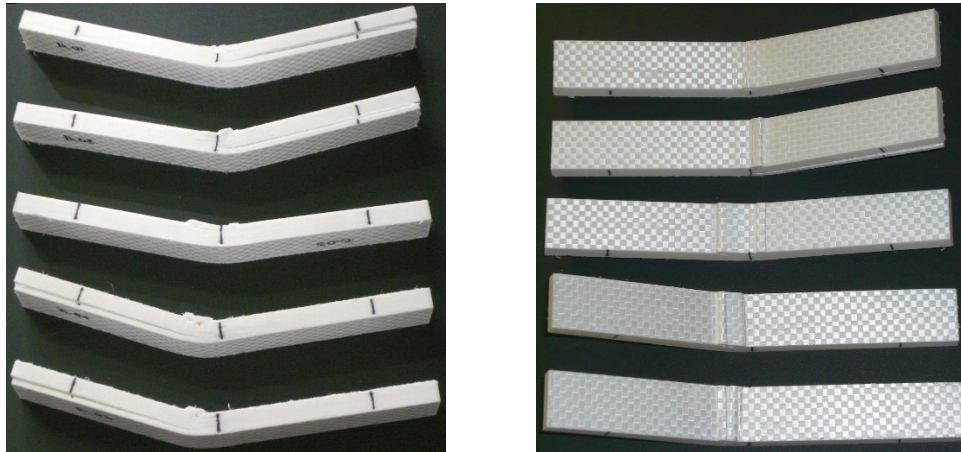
Specimens at the end of the bending test: side view on the left, top view on the right.
